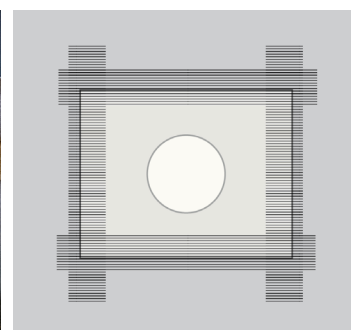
Weep hole example detail: fix min. 300mm size square over a 75mm weep hole using jointing tape
